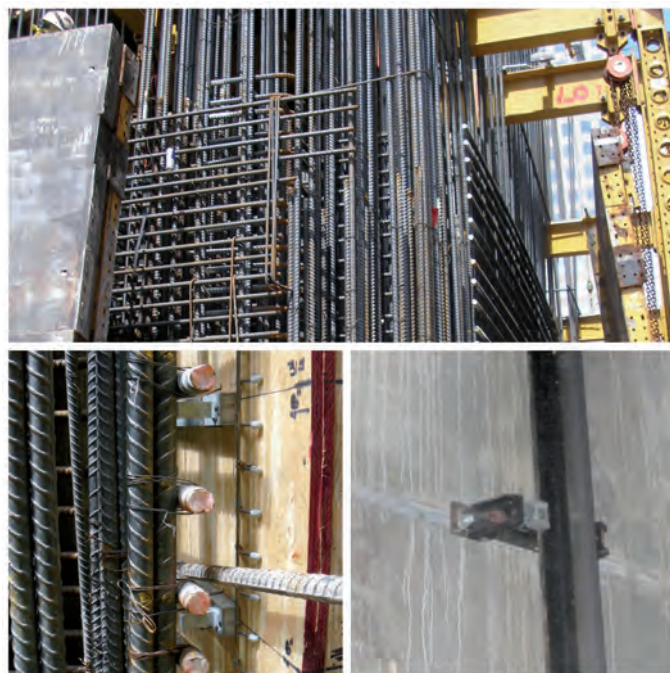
Highly reinforced elevator shaft (top); cast-in anchor channel fixed to the formwork before concreting (bottom left); elevator guide rail fixed to hot-rolled cast-in channel (bottom right) (Source: HALFEN GmbH)
